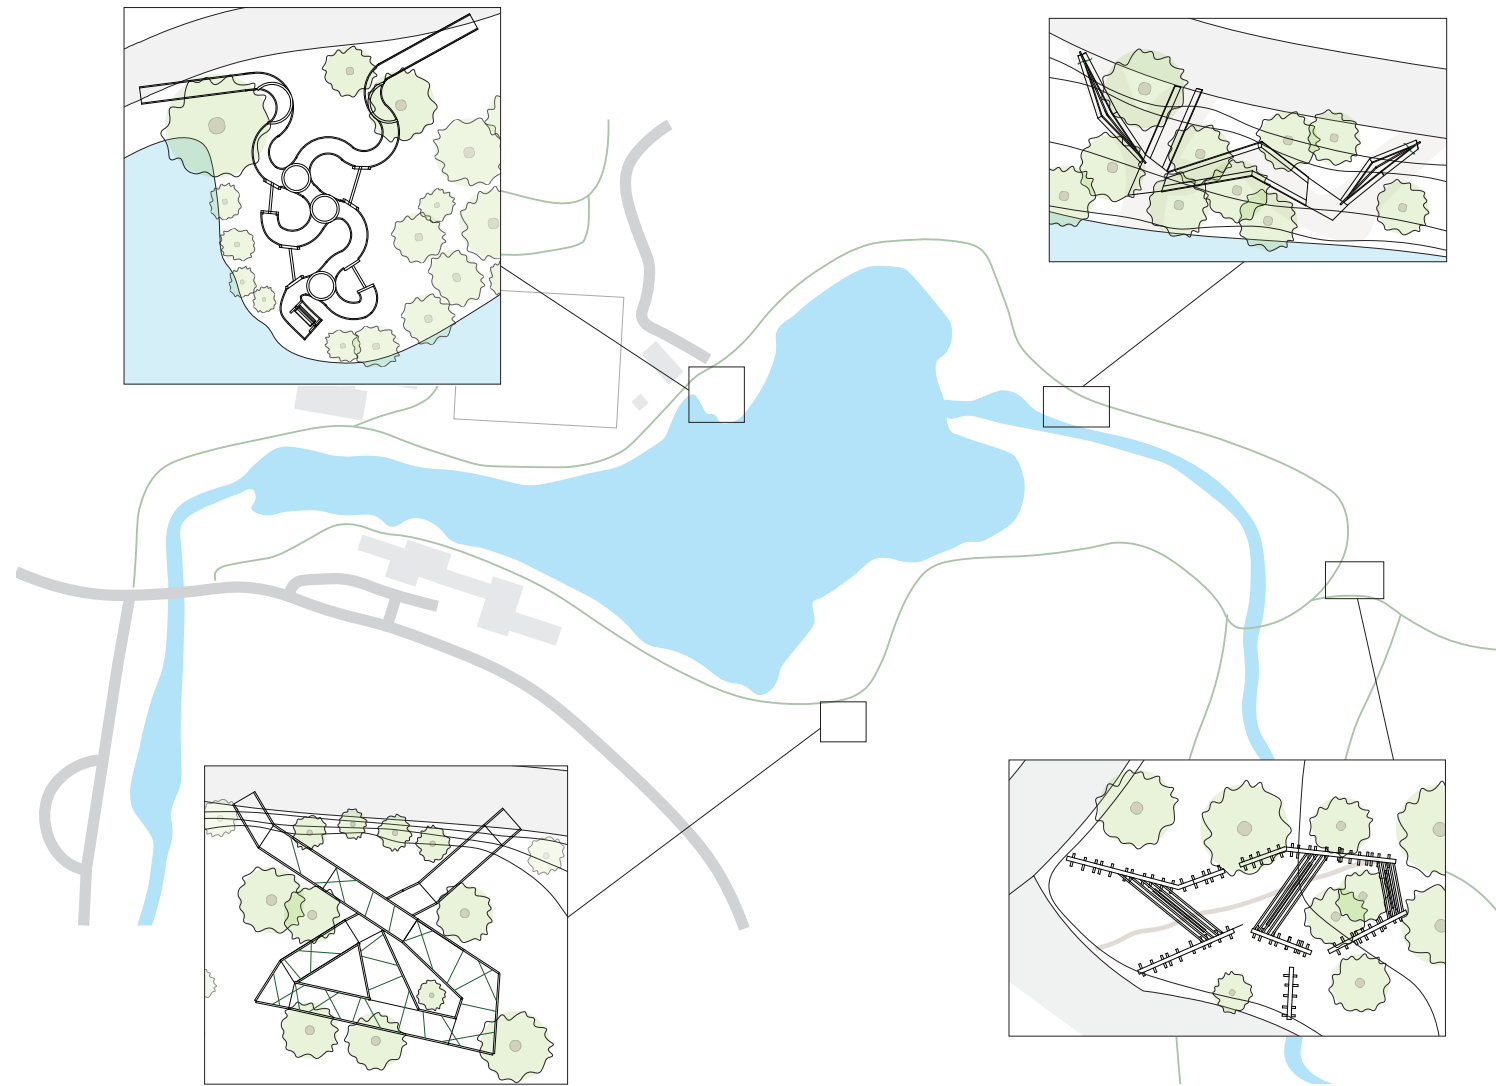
Upper Lake Loop Trail with identified sites & structure plans
